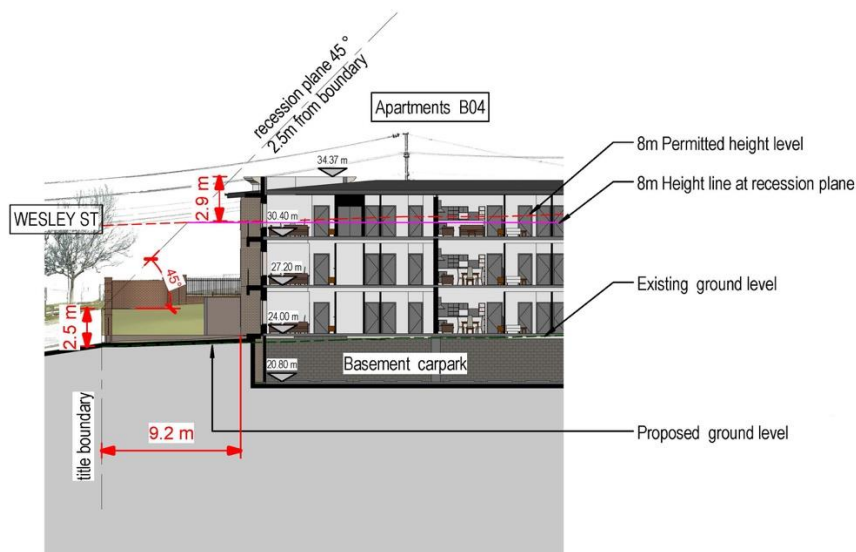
Section A through Building B04 (Ryman Drawing A3-030 RC12).
